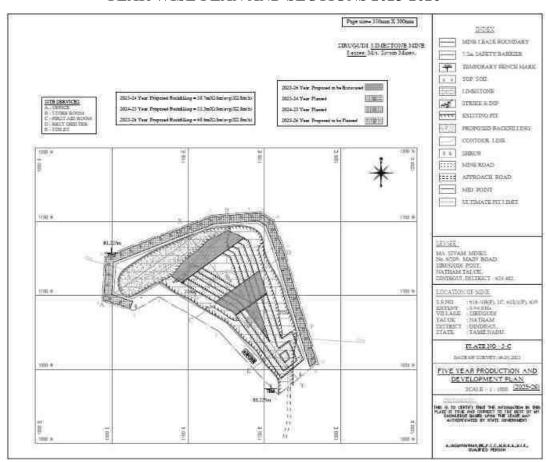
YEAR WISE PLAN AND SECTIONS 2023-2024
